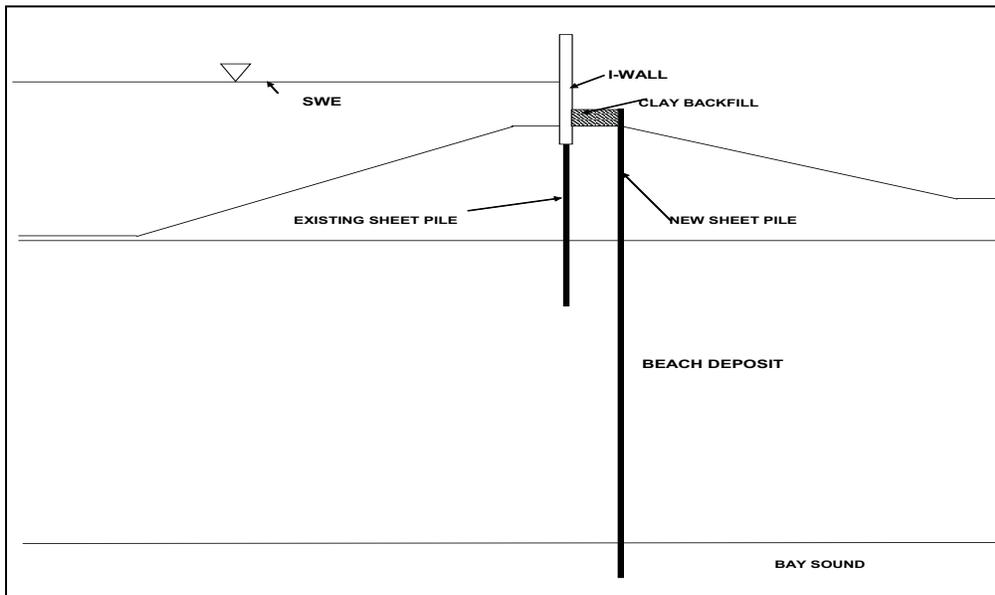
Conceptual drawing of protected side sheet pile cutoff wall
